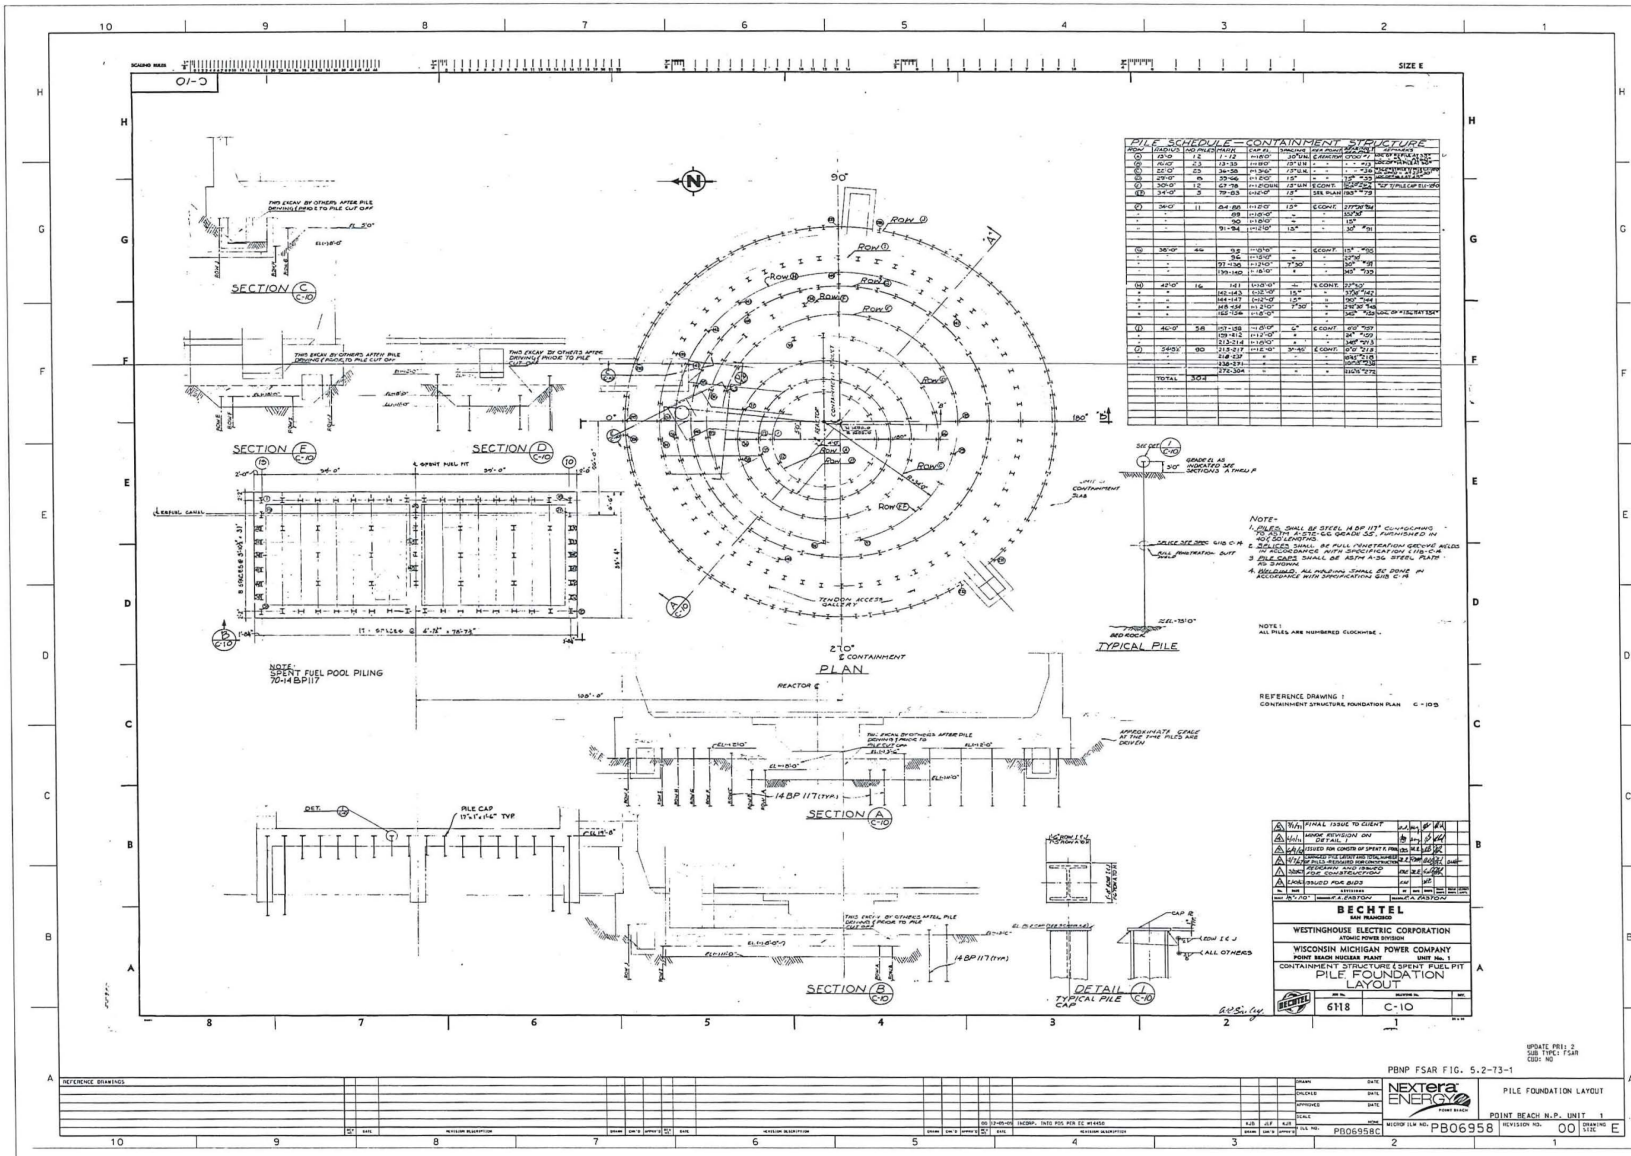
PILE FOUNDATION LAYOUT
